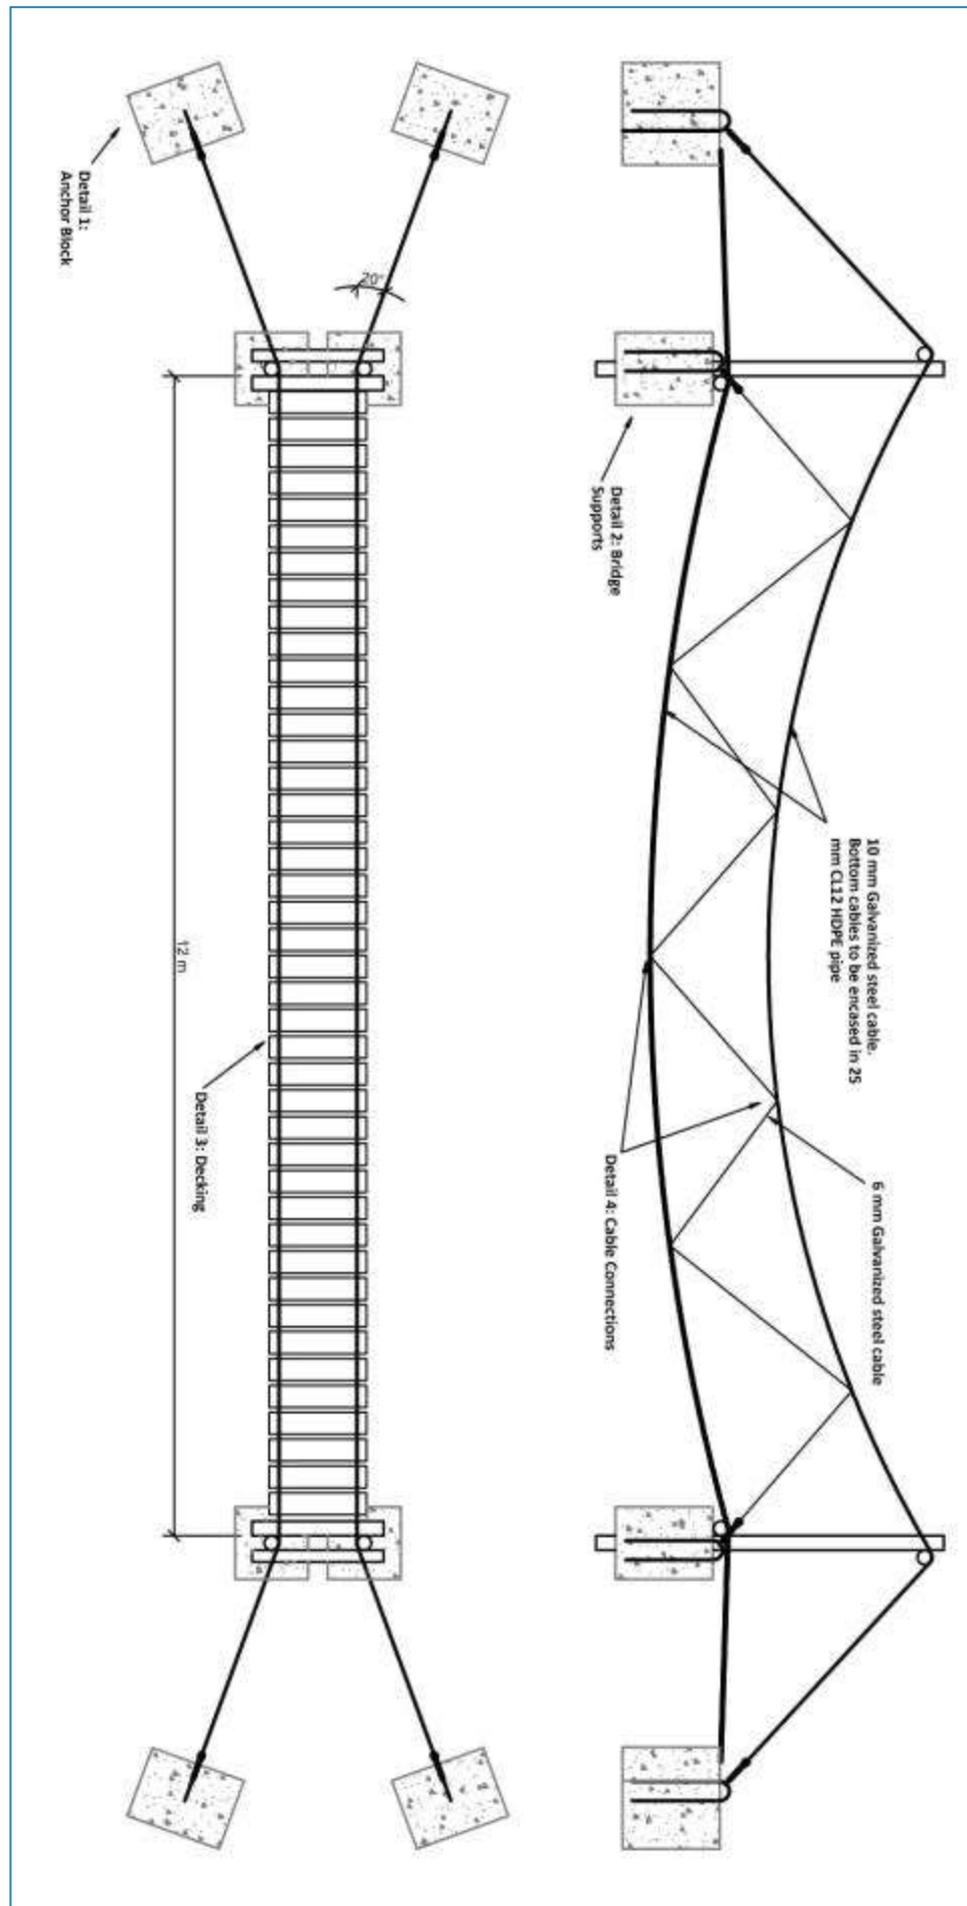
TYPICAL DESIGN LAYOUT FOR A SIMPLE SUSPENSION BRIDGE
